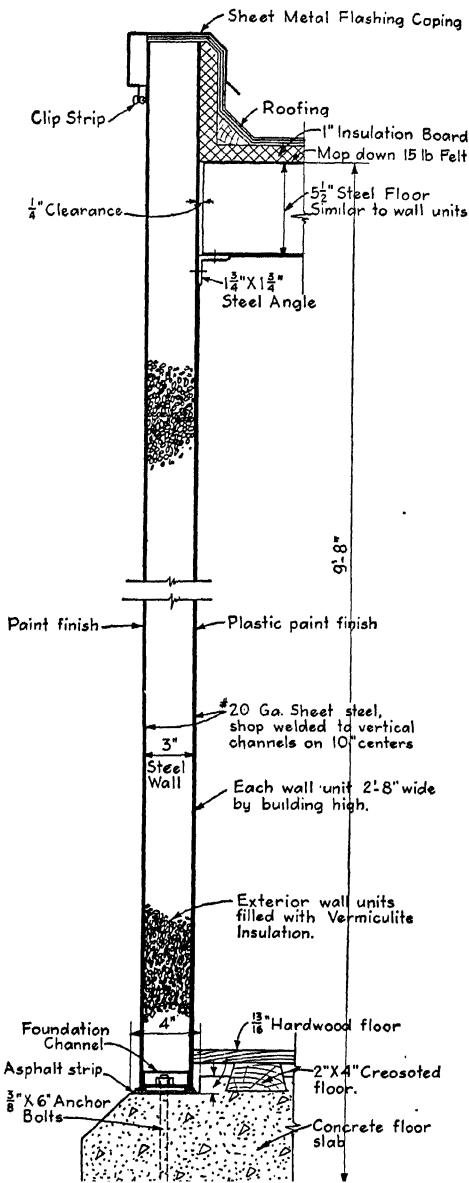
Section of Wall in Steel House Showing Typical Methods of Insulation
